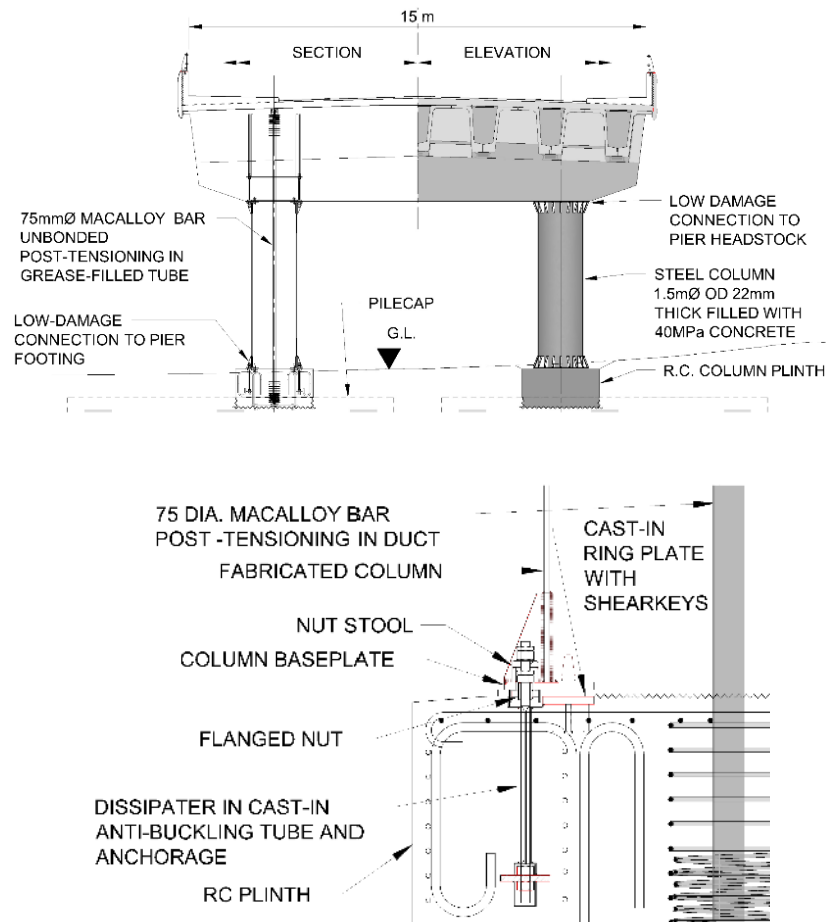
Detailing used on the Wigram Magdala Bridge (Routledge et al., 2016)
